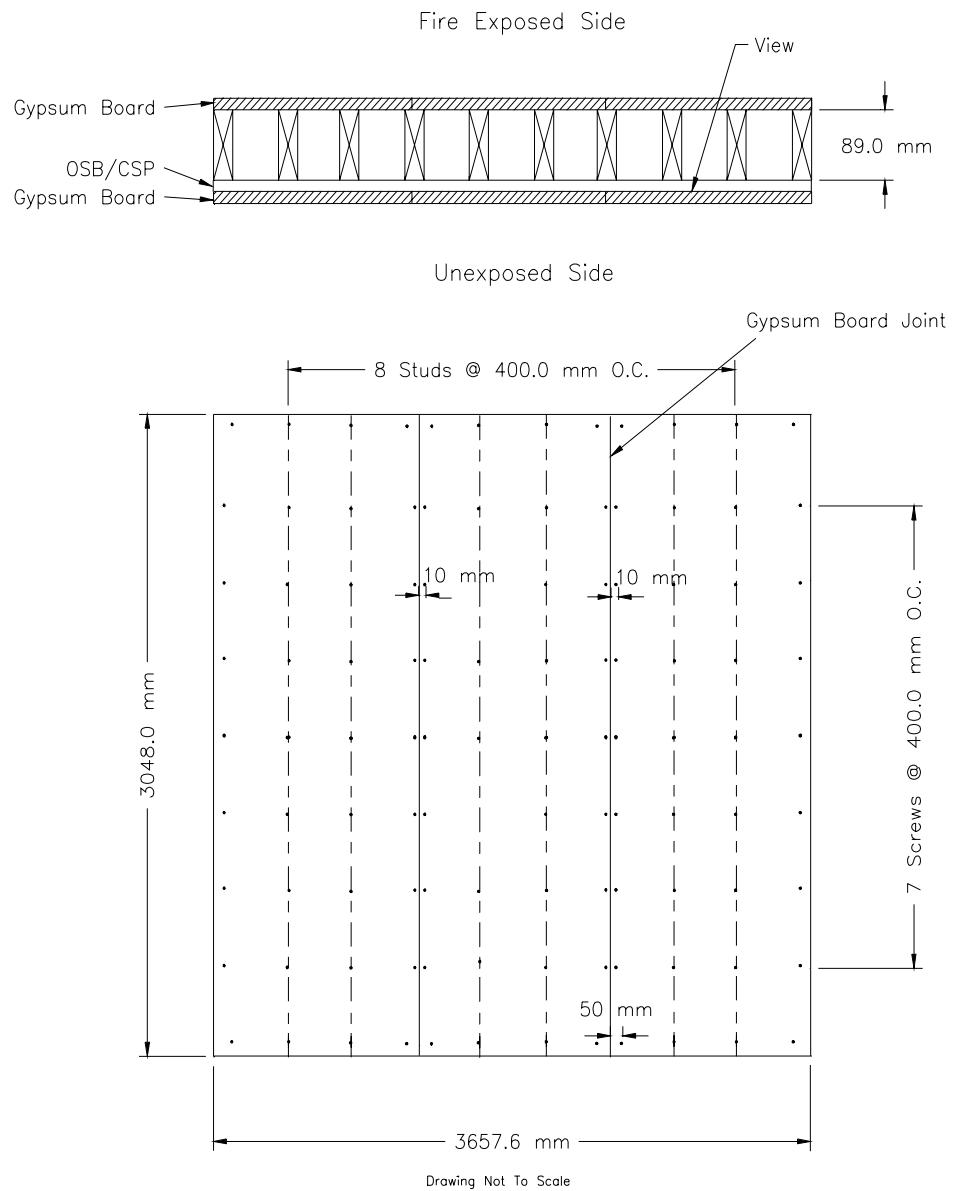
Screw Locations for Wood Stud Wall Assemblies, 1x2 Face Layer Unexposed Side (F21,F21A,F22,F22A and F24)
